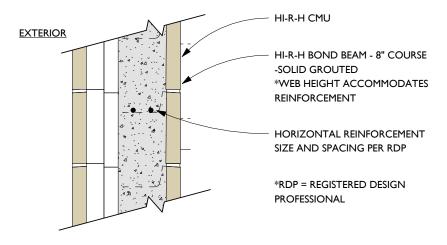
HI-R-H - Foundation - HI-R-H Basement Wall
